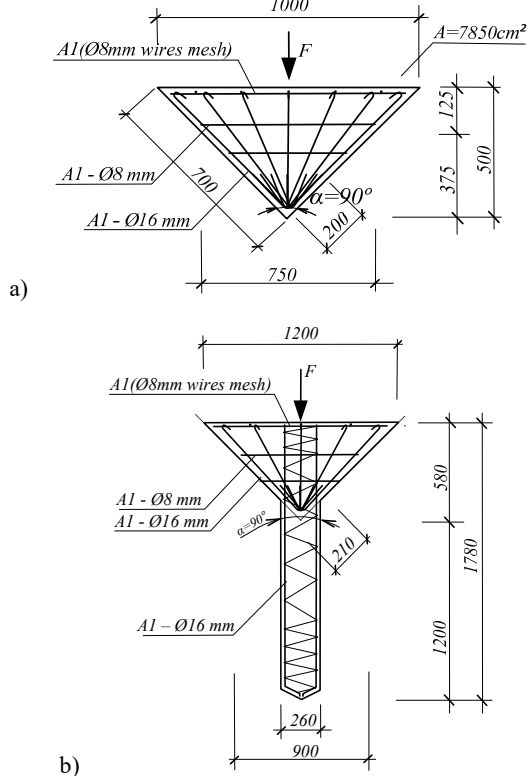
Reinforcement layout for conical foundations: (a) Conical block with an opening angle of 90°; (b) Cone-top foundation with a pile-stand.
